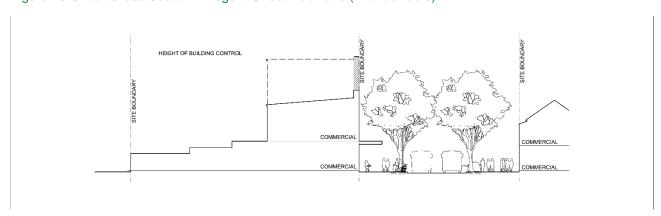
Street Cross Section - Regent Street Additions (Parapets)
